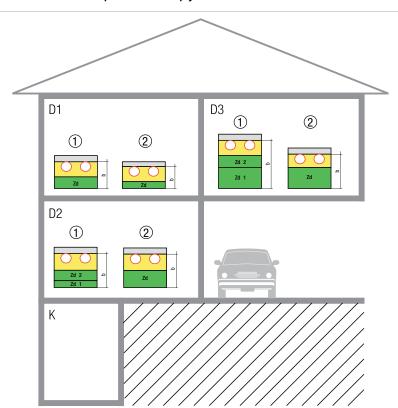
Example installation plan for the REHAU base panel TS-14
